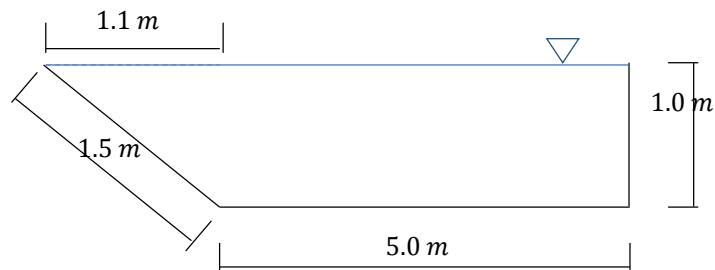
Typical Cross-Section of First Creek for design of Gabion Retaining Wall, as evident from the site visit
